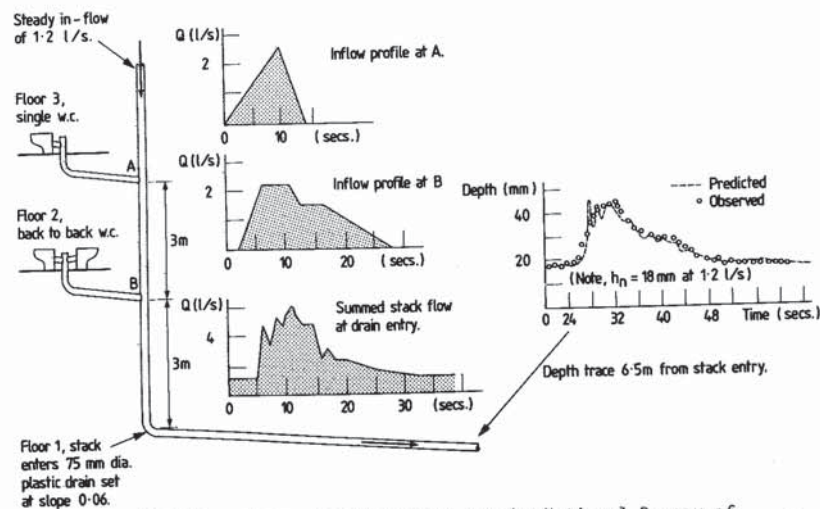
Validation of the computer model at the National Bureau of Standards, Centre for Building Technology, plumbing tower facility.
